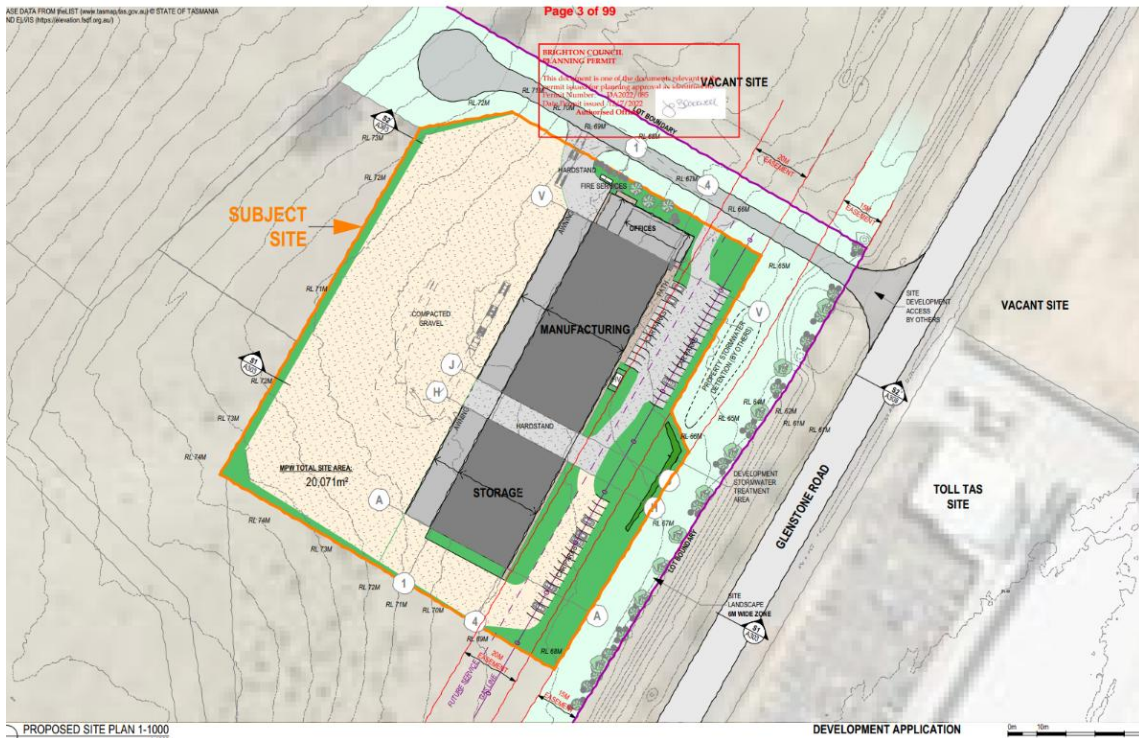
Approved site Plan 5/221 Glenstone Road, Bridgewater
